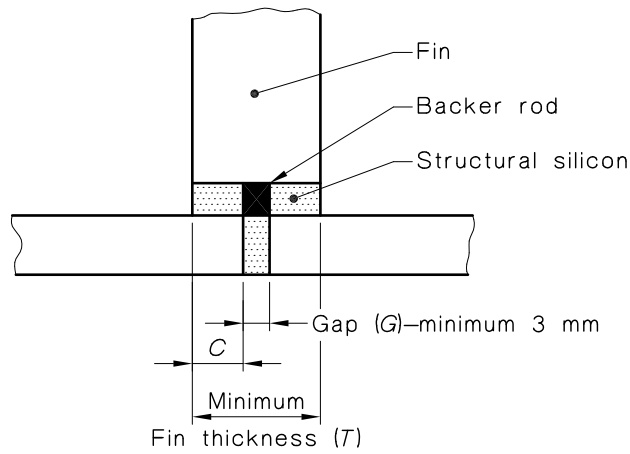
PLAN SECTION OF STRUCTURAL SILICONE JOINT
